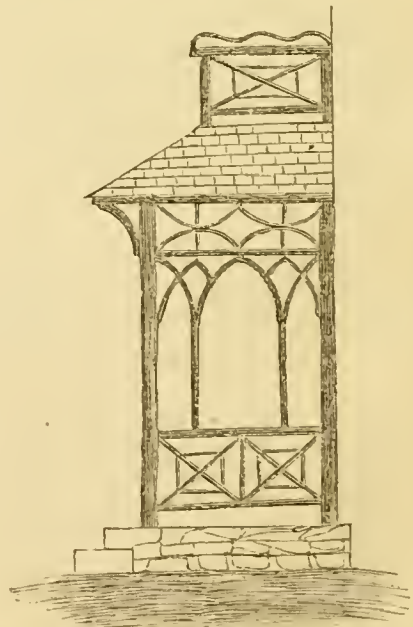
is a side elevation. It is "hip" roofed and shingled, and has a balcony on the roof.
